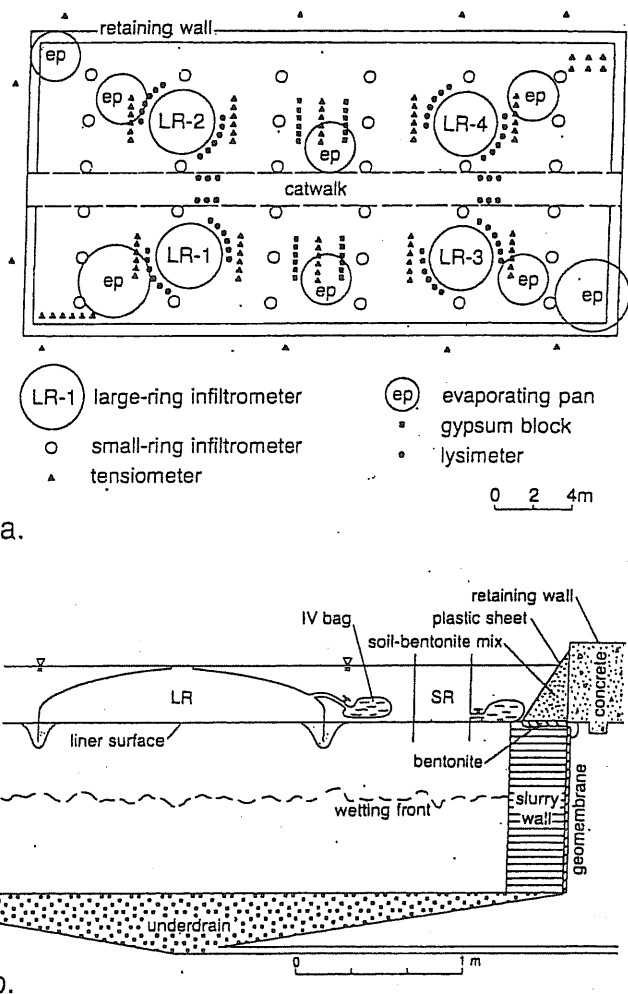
Field instrumentation for soil liner: (a) plan view showing locations of infiltrmeters, evaporation pans, tensiometers, and gypsum blocks; and (b) cross section across retaining wall and infiltrmeters (Cartwright et al. 1993)
